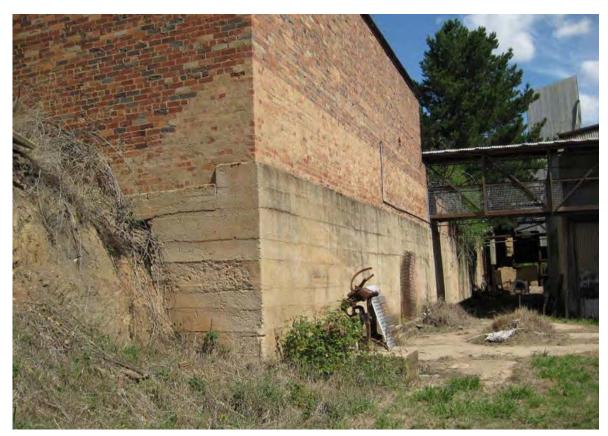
The north end of the concrete / brick retaining wall. (Source: Lovell Chen, 2010)
